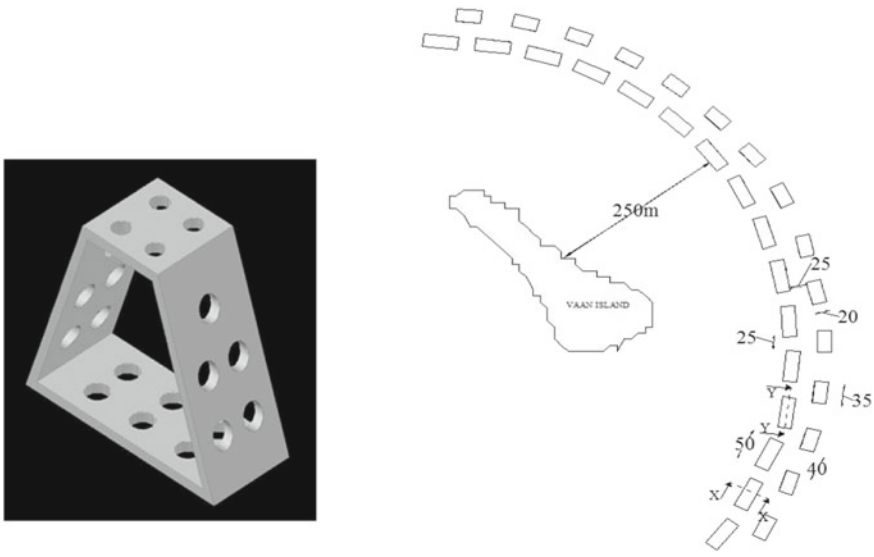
Cross section and plan of artificial reefs in Vaan island
